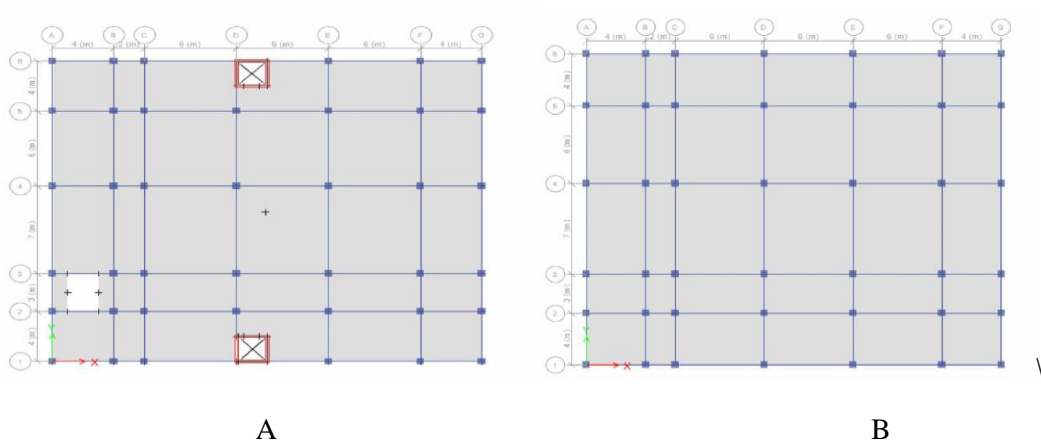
1: Regular Frame with a shear wall around the lift and same without a shear wall, 6*5 bays floor plan
